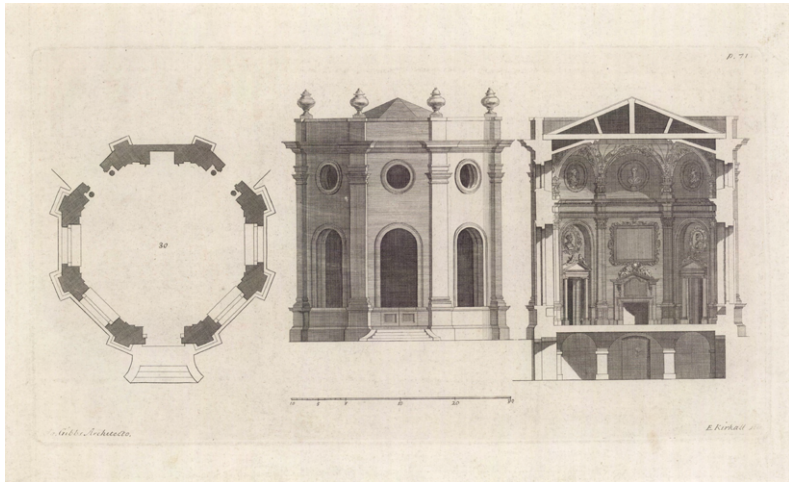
Plan, elevation and section of the Octagonal Room, Orleans House. Engraving: E. Kirkhall after James Gibbs, circa 1720.
